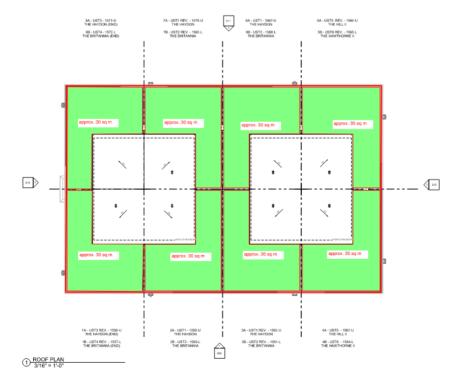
Area of rooftop terraces on 16 unit stacked dwelling building with no setback (Block 4 of Site Plan).
